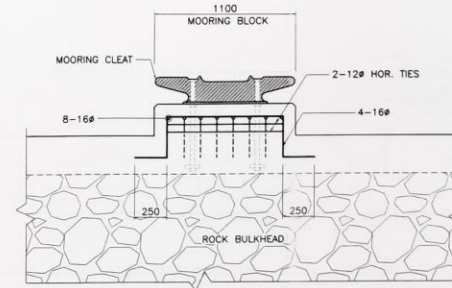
DETAIL OF R.C. CURB @ ROCK BULKHEAD
